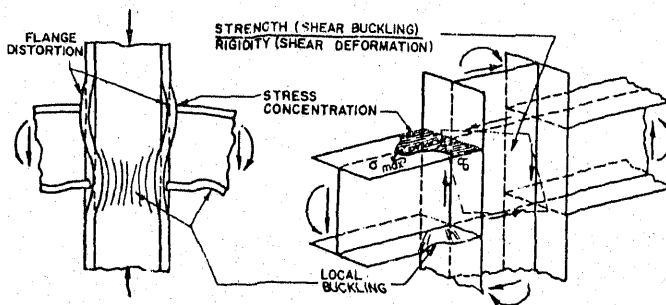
PROBLEMS INTRODUCED AT BEAM-TO-COLUMN CONNECTION
